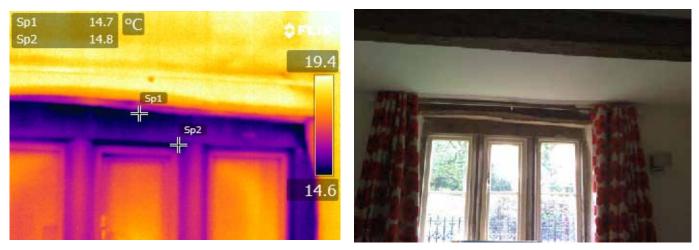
White House Farm, Stirton, Skipton – Thermal bridging on mullion and air ingress around lintel (NB. lower portion of window mullions are subject to solar gain).
